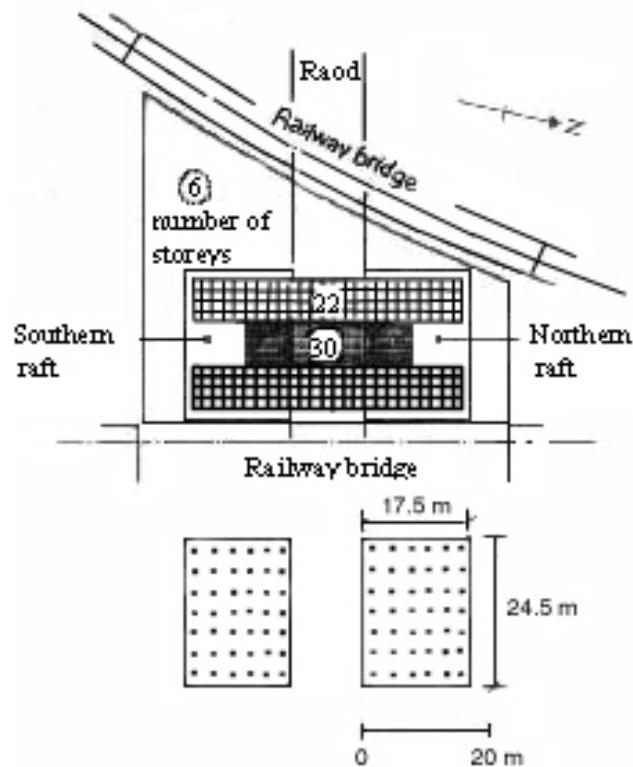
Messe-Torhaus building, site plan (Shen et al, 2000)
